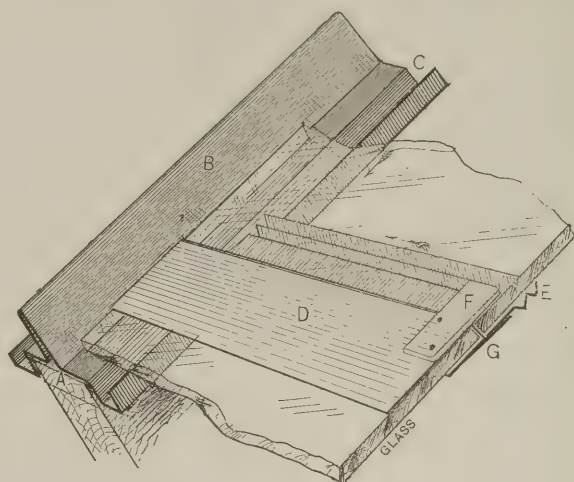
Perspective View Showing Cross Joints and Clips.
